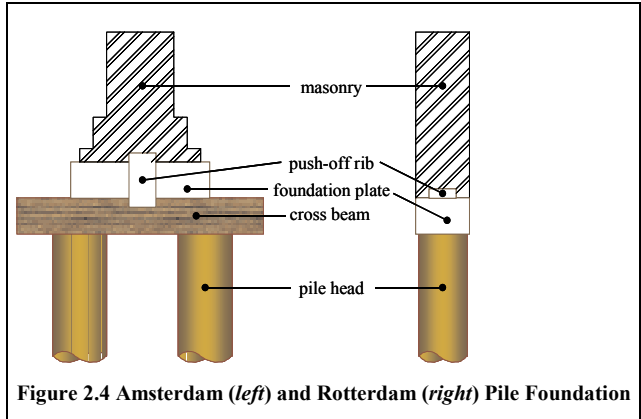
Amsterdam (left) and Rotterdam (right) Pile Foundation
